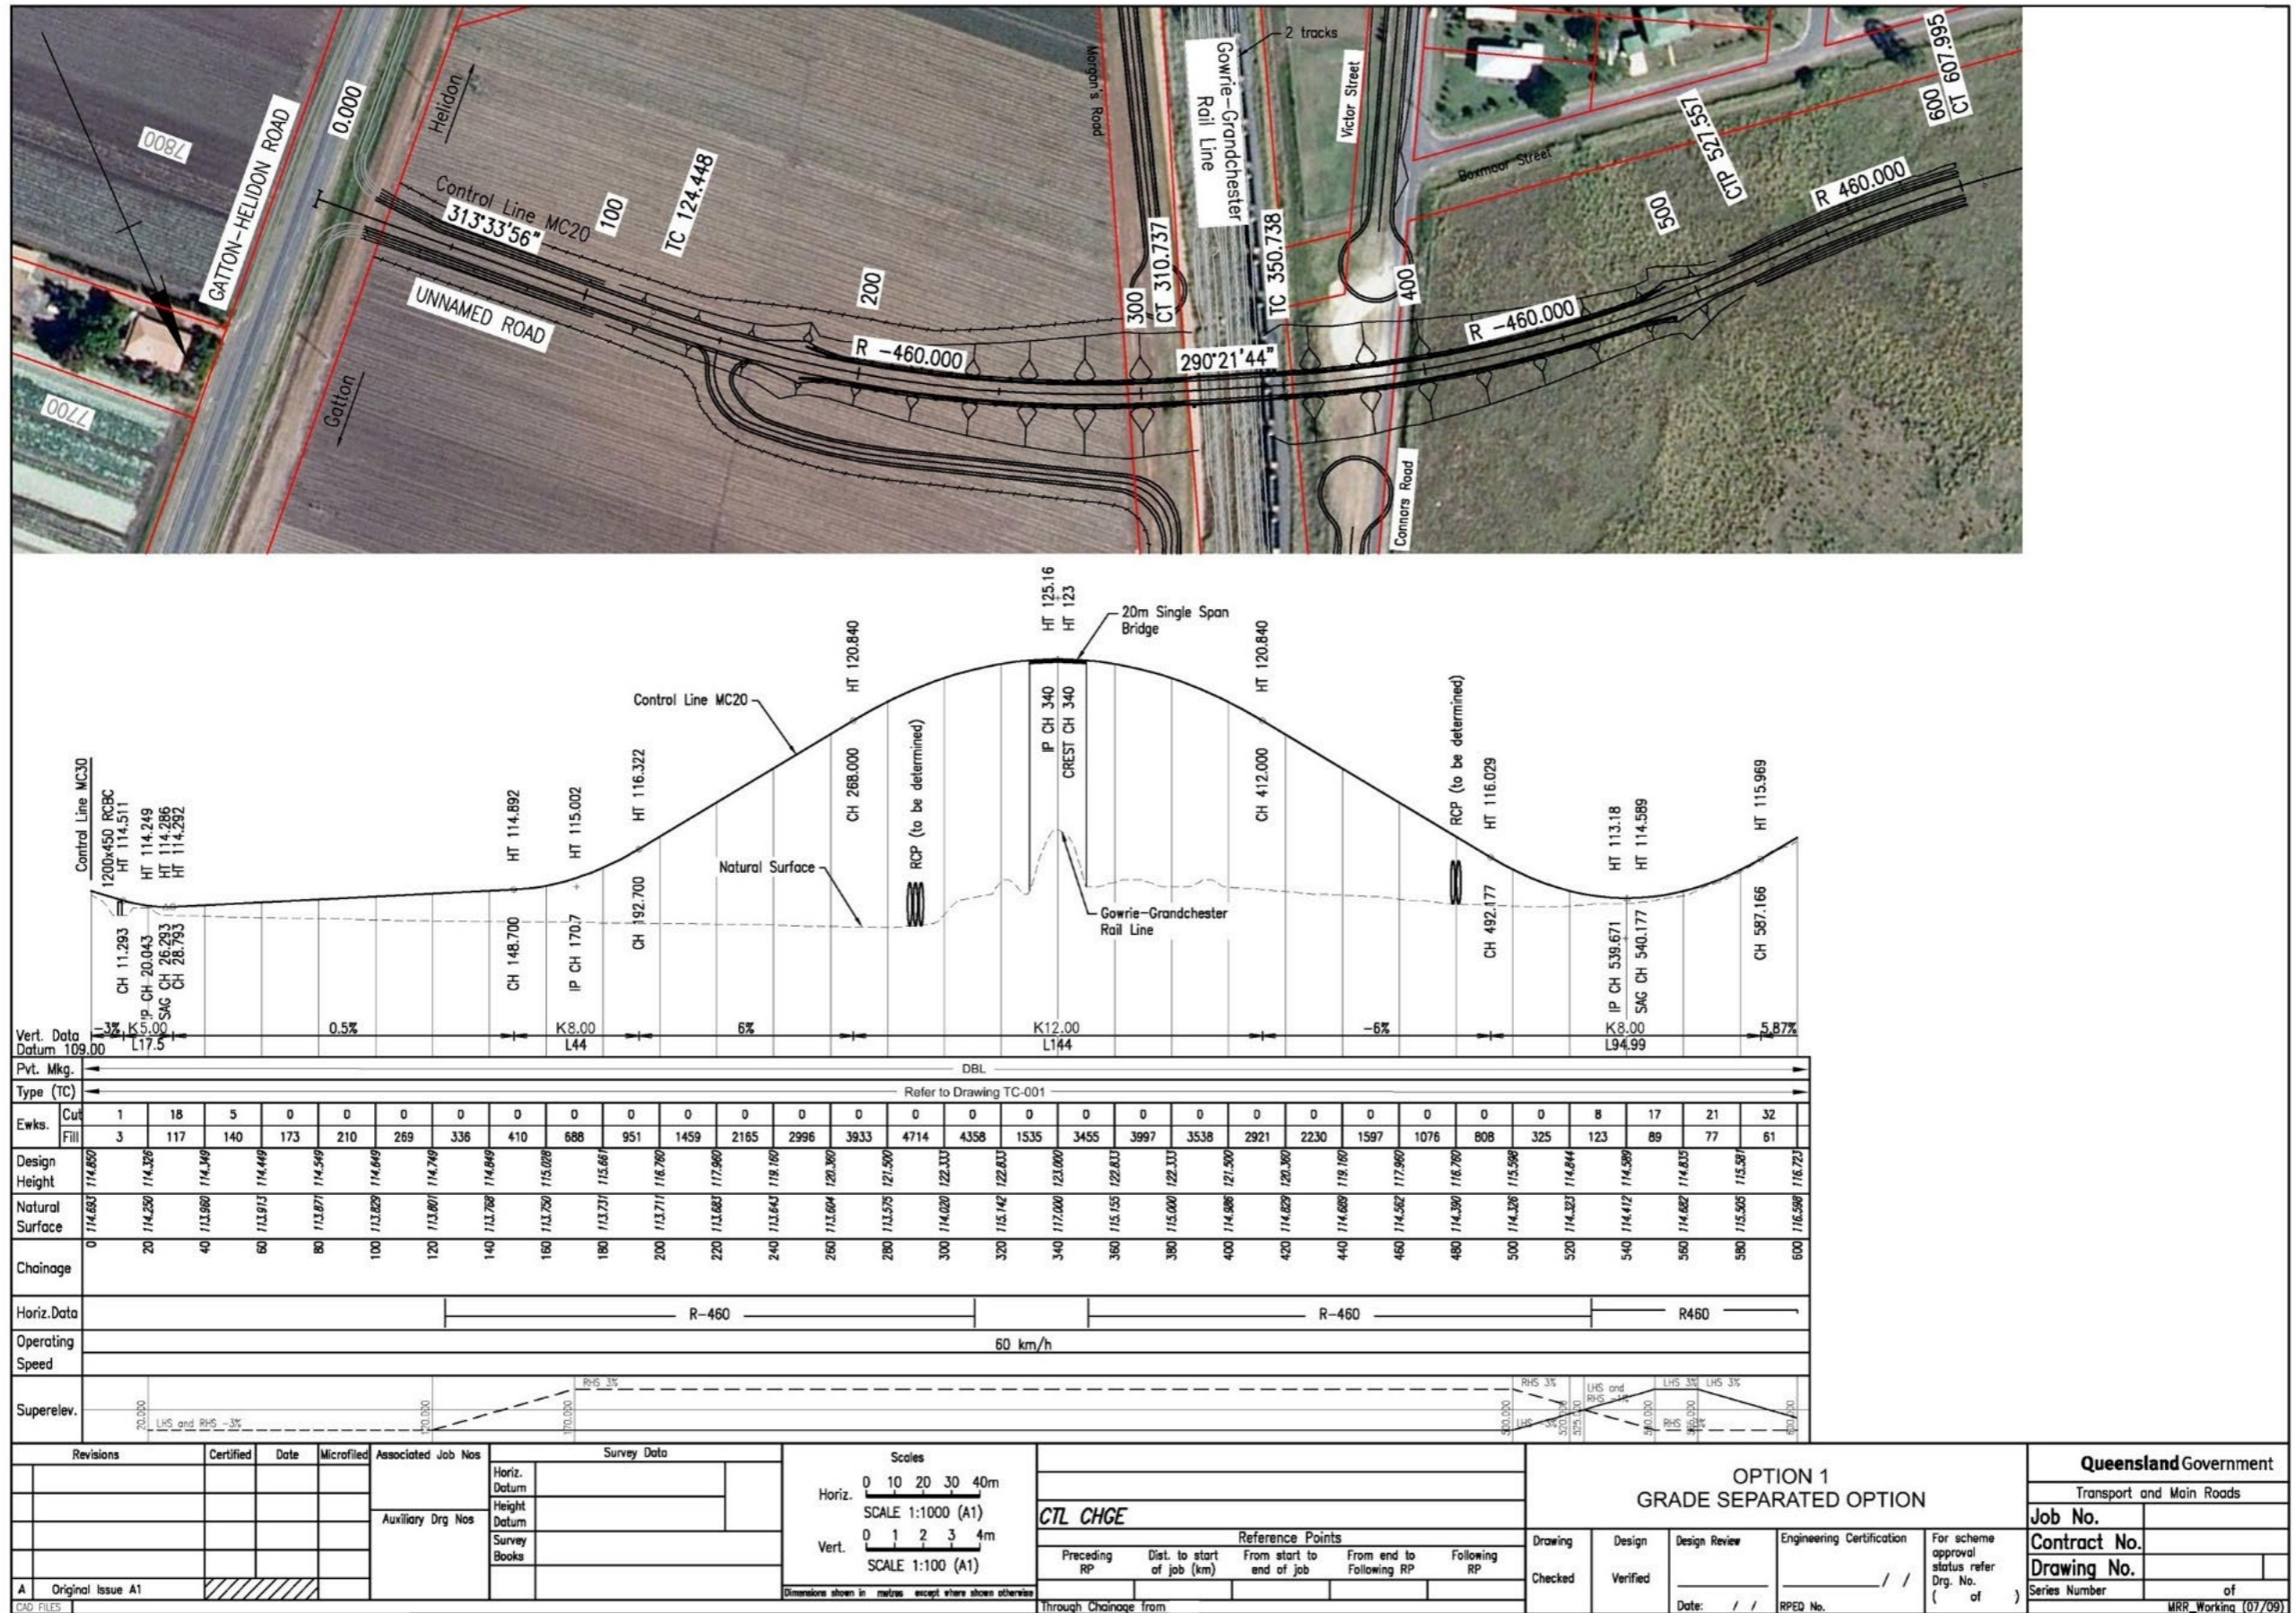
(b) – Working plan and longitudinal section – business case generic example – sheet 2 of 2
